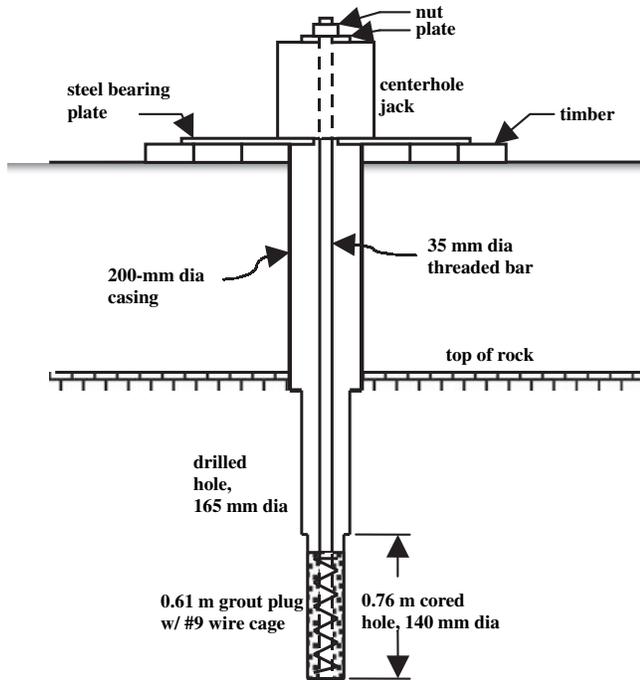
Small-scale pullout test used in Florida limestone (after Crapps 1986).
